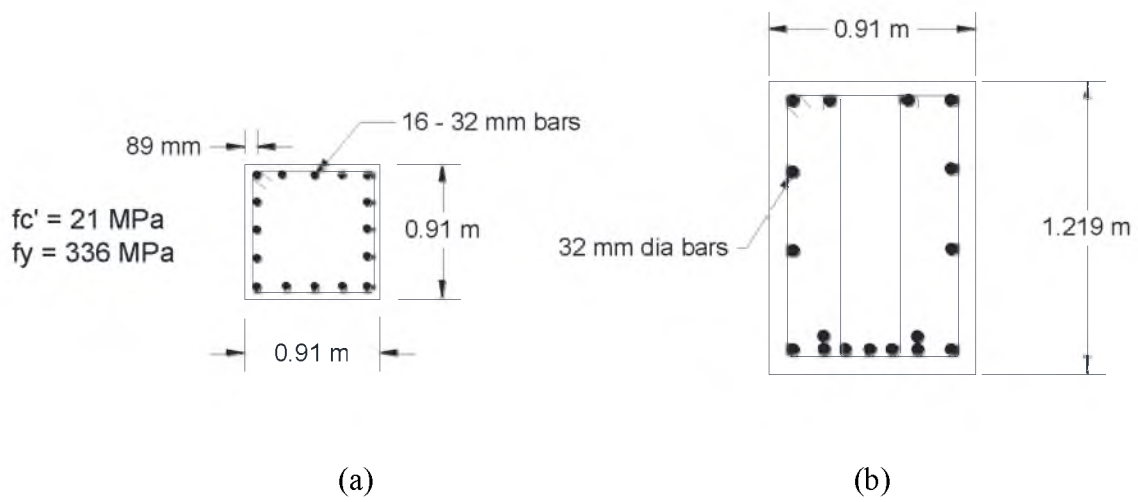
Sectional details of (a) Column and (b) Bent beam
